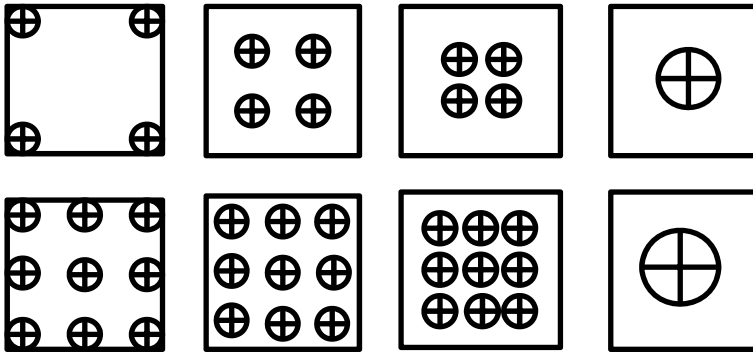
Column arrangement for 2 × 2 and 3 × 3 group of stone column
